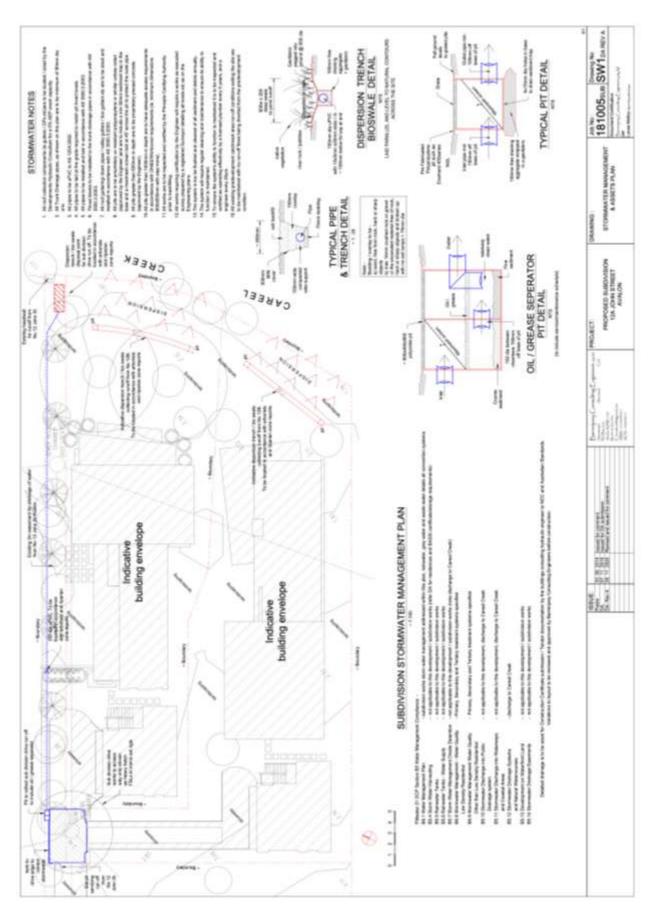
Stormwater Management and Assets Plan. Source: Barrenjoey Consulting Engineers Pty Ltd,.2021
